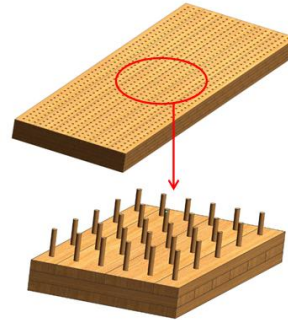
Typical tested adhesive free three-ply CLT panels (assembled through compressed wood dowels)
